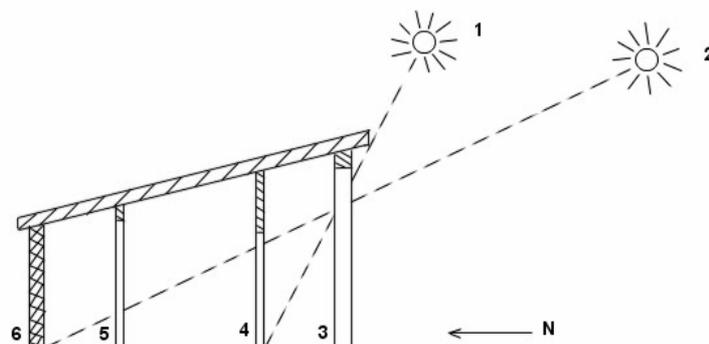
1-solar radiation in south elevation in summer, 2-solar radiation in south elevation in winter, 3-terrace with a roof, 4-living room, 5-store, 6-northern isolating wall
